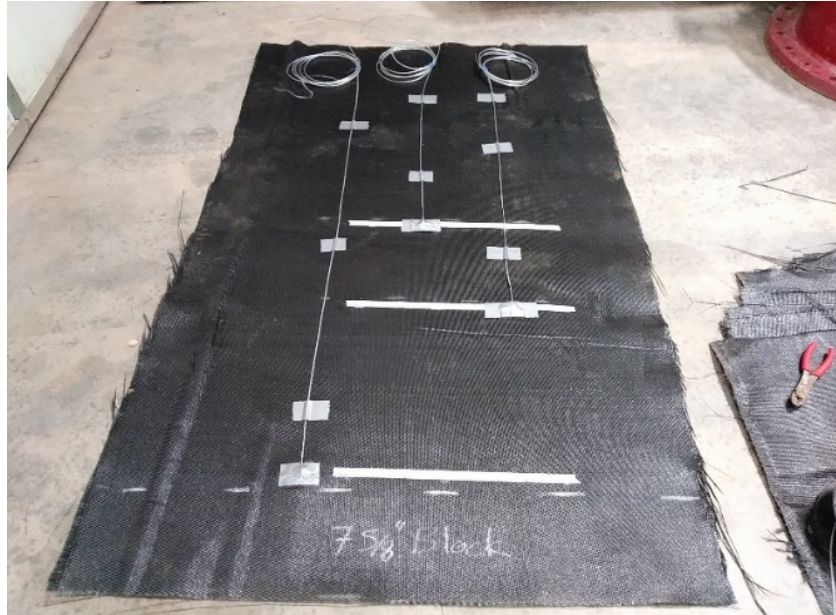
Example wirepot connections on a geotextile layer before installation in a GRS abutment model
